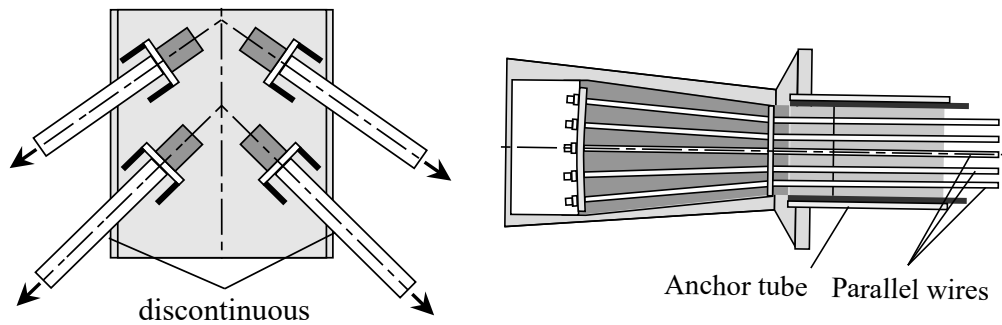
Examples of clamping cable anchors. Cable anchor in a pylon (left) and anchor socket at bridge deck (right).
